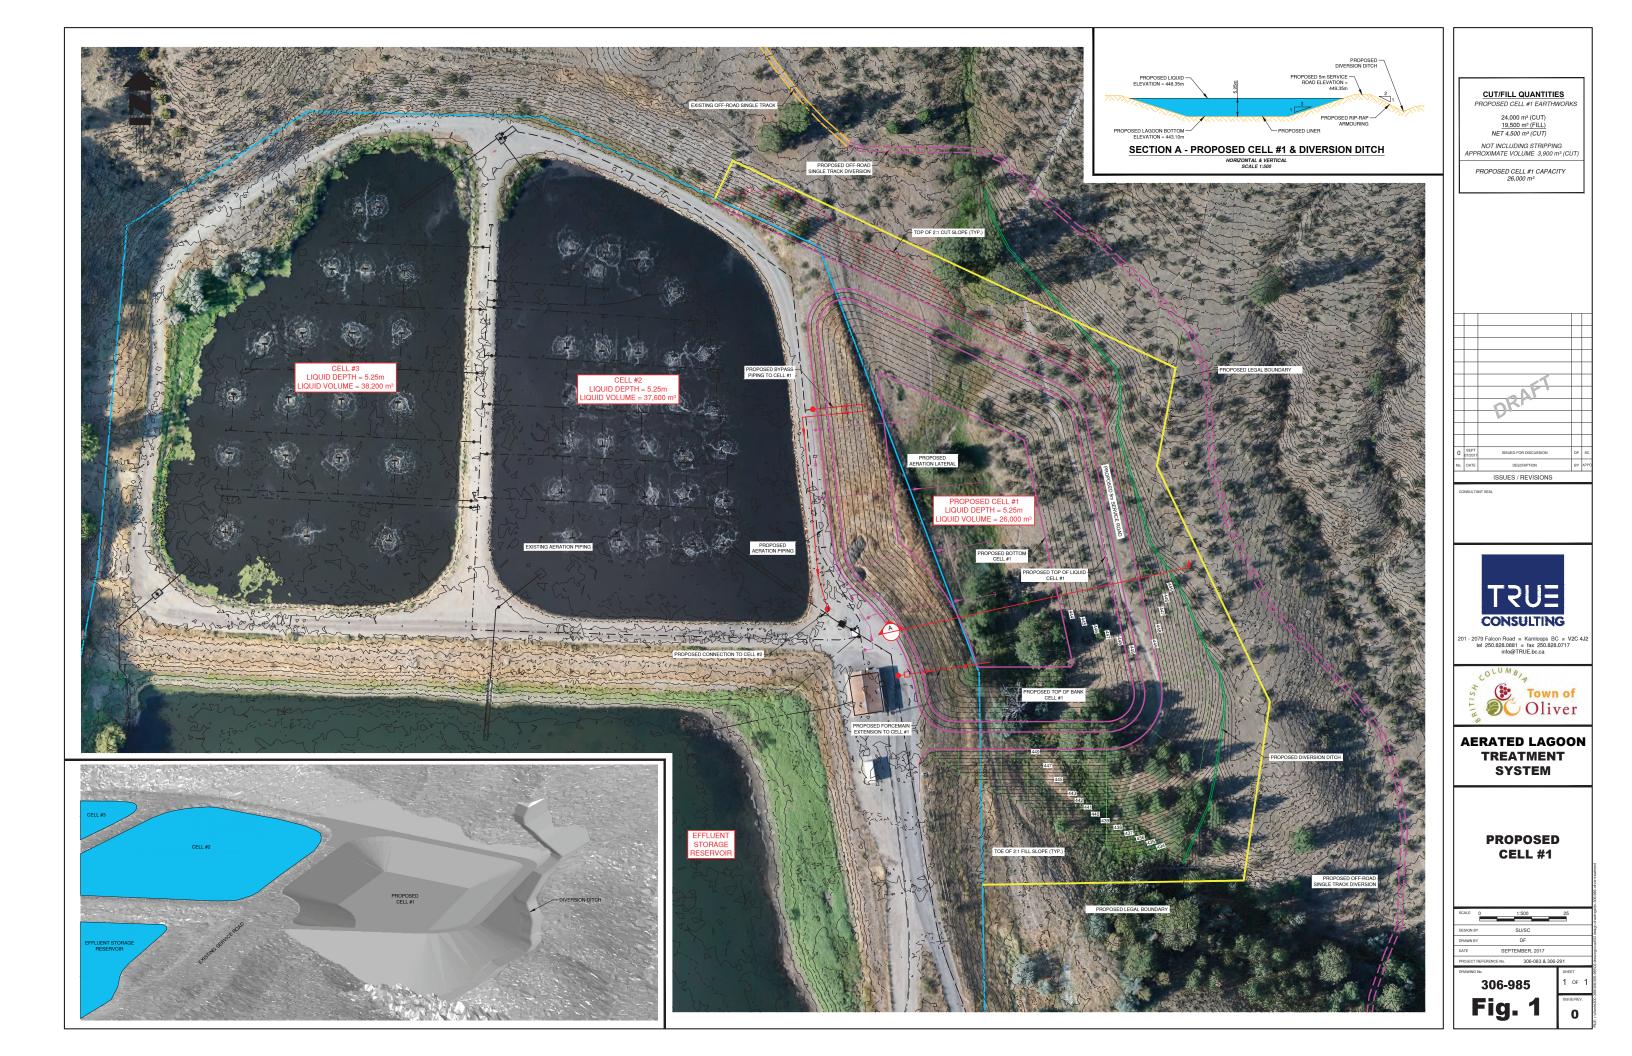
Aerated Lagoon Treatment System Layout and Intercell Piping
